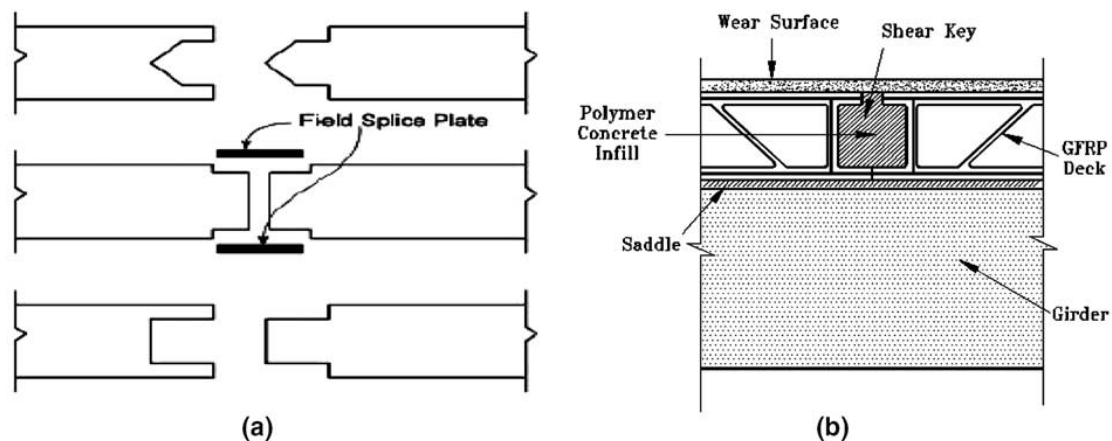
Joining techniques of panel level connections (a) adhesive bonding (b) mechanical connection (Zhou & Keller, 2005)
